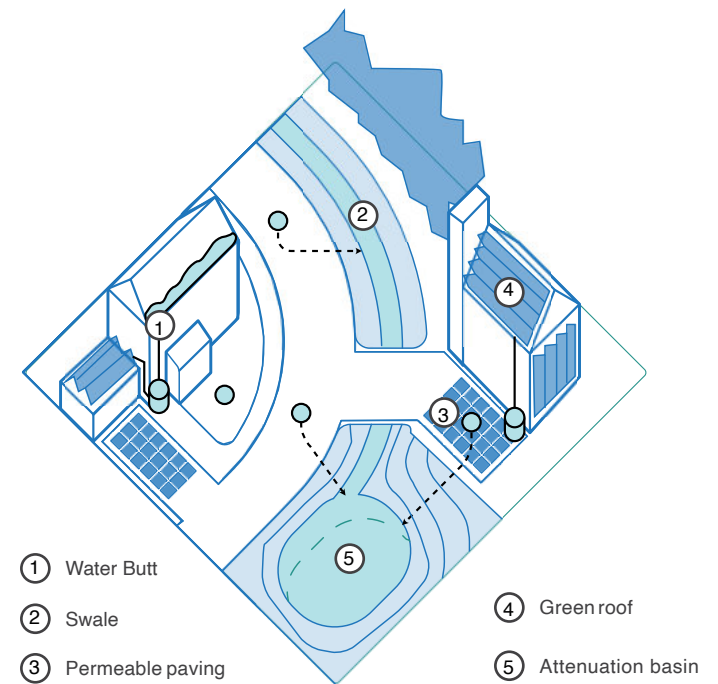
Diagram showing the best use of harvesting water systems rain garden, swales, permeable paving, green roofs
